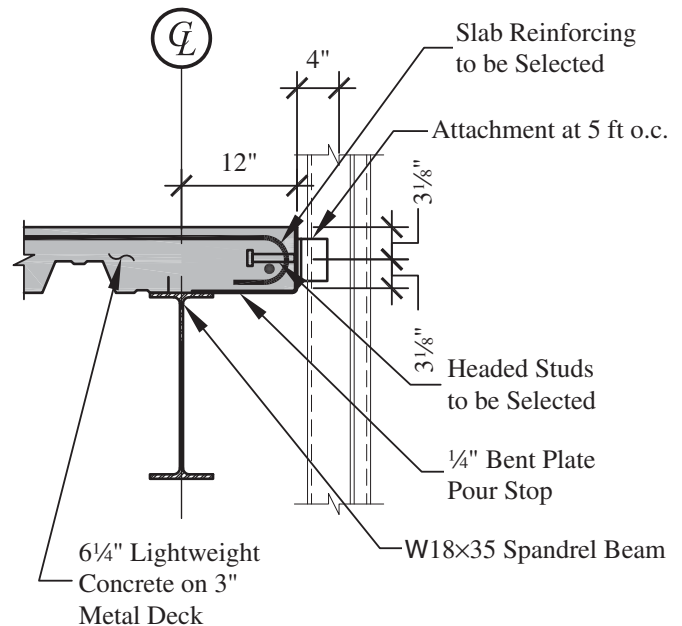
Section of slab edge with bent plate pour stop with headed studs acting as façade anchorage.
